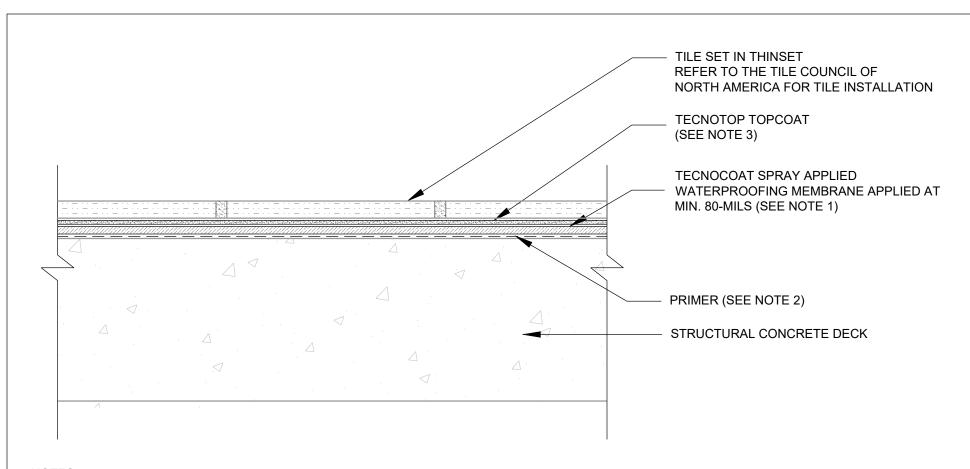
DETAILS ARE INTENDED TO BE A GUIDE FOR WATERPROOFING INSTALLATION ONLY
